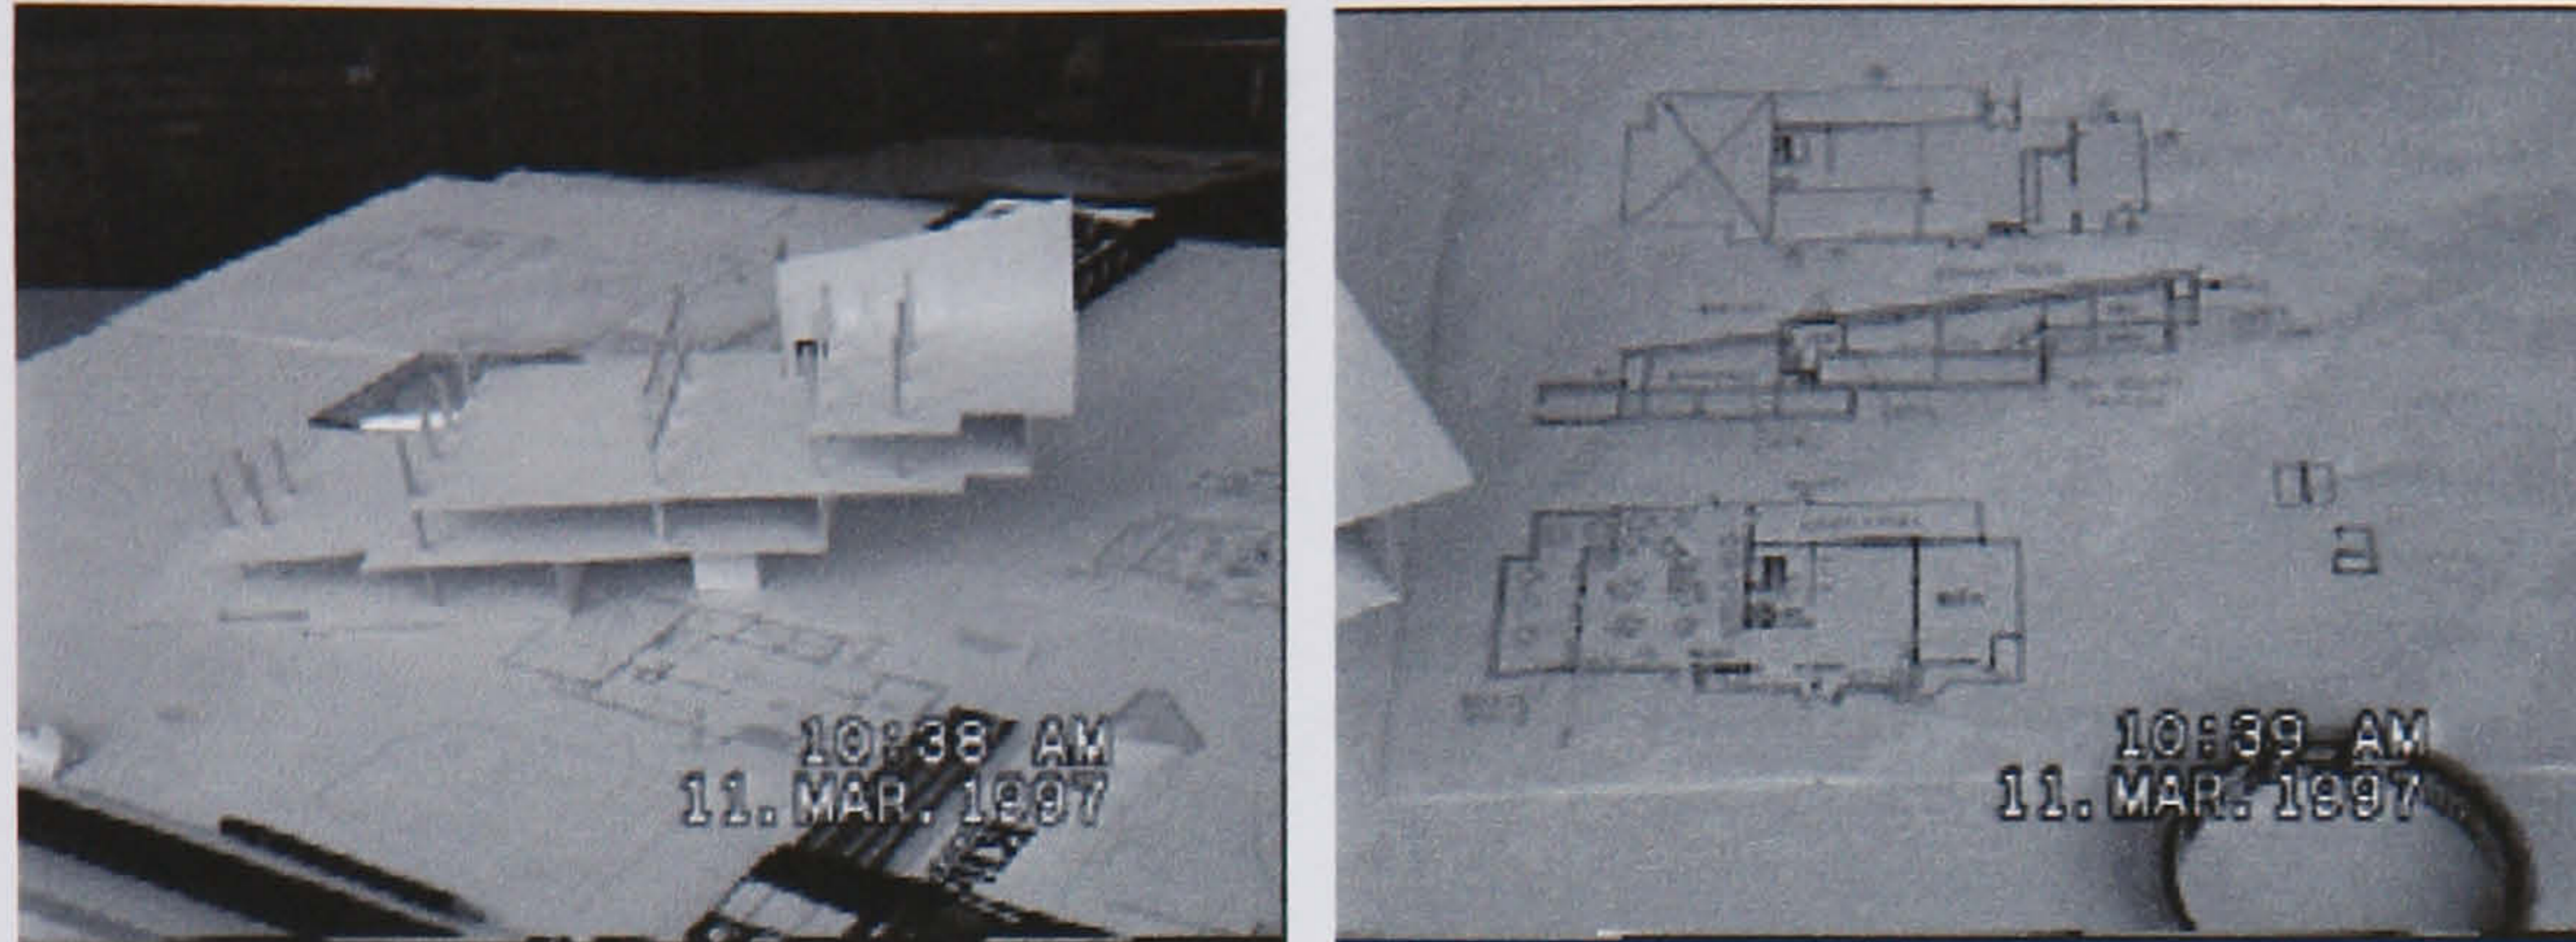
(a) Initial model and (b) reduced scale plan and sectional sketches of the building.
